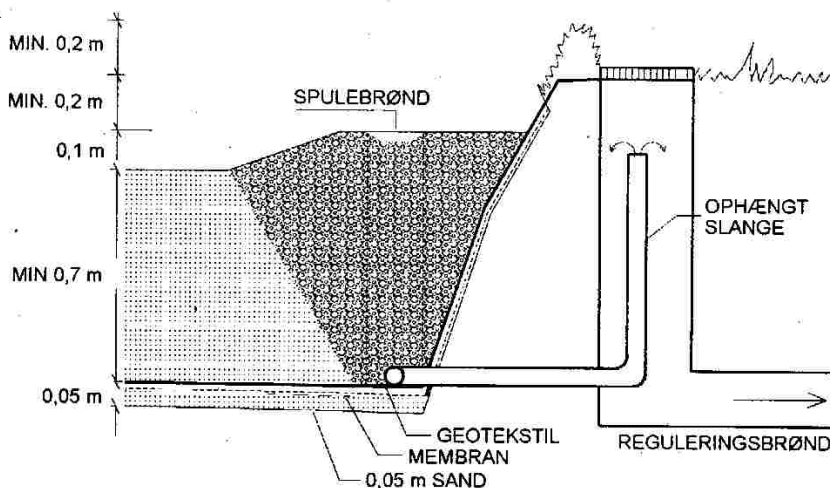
Cross section through the outlet arrangement of a root-zone system
